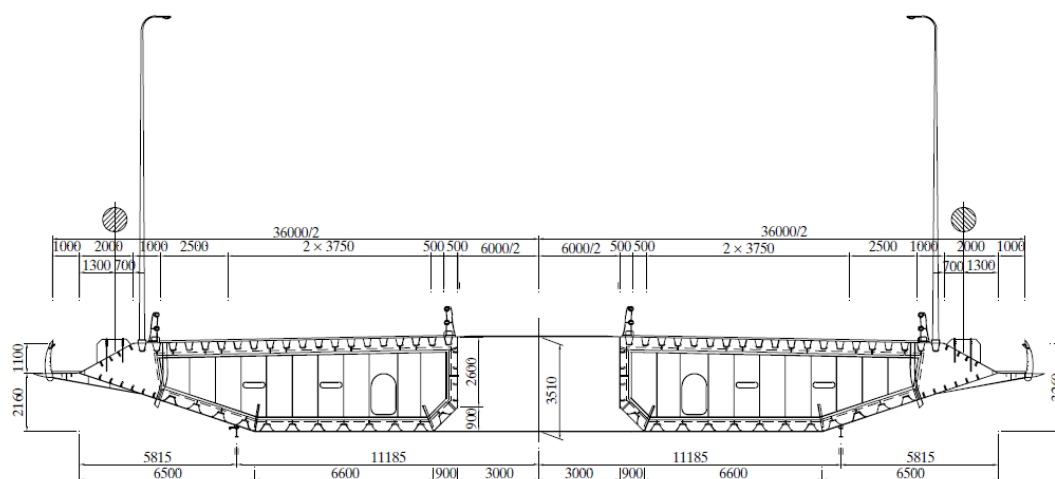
Typical cross section of the twin-box girder (Units: mm)[17]
